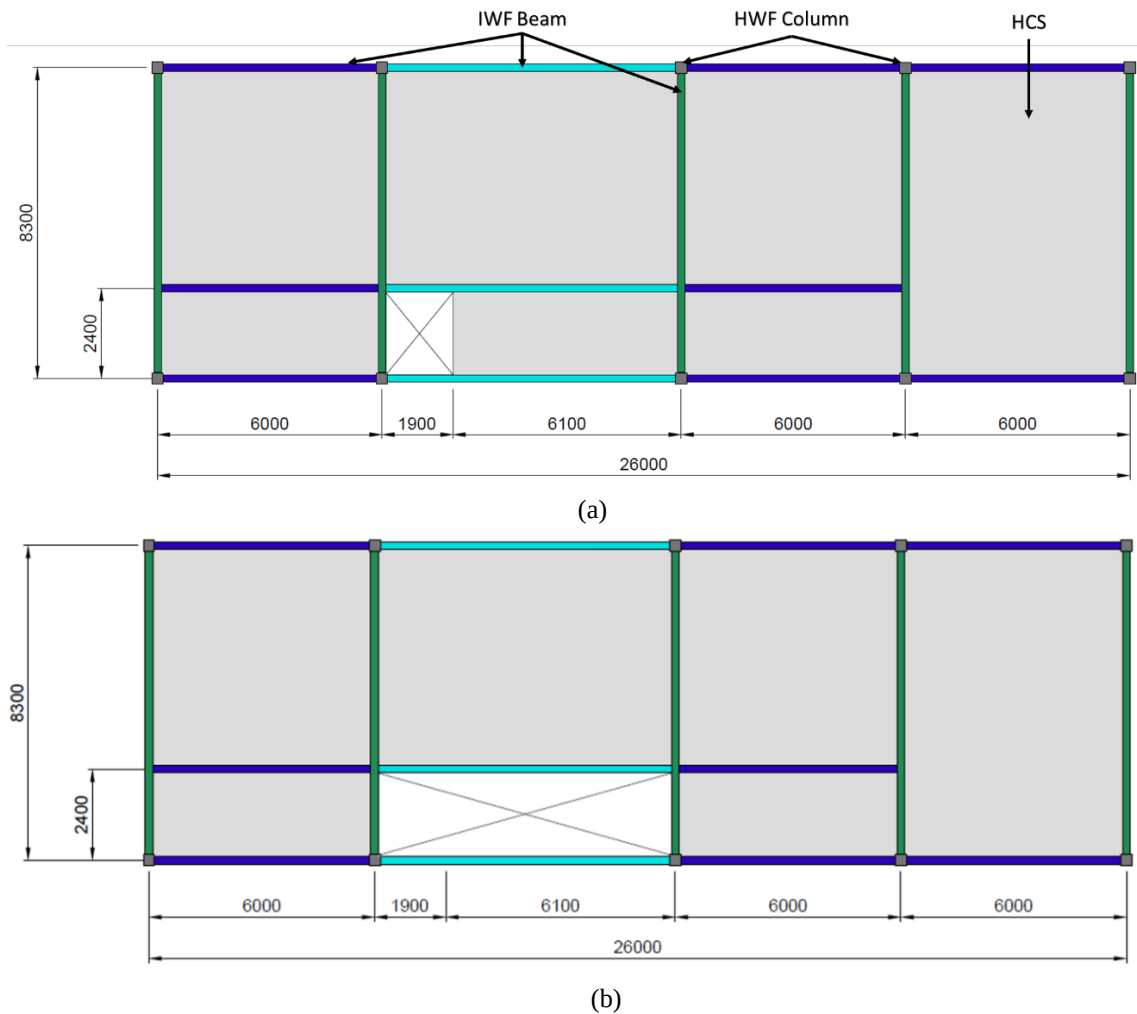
Parking Building Structure Plan (a) 1st Floor, and (b) 2nd Floor.
